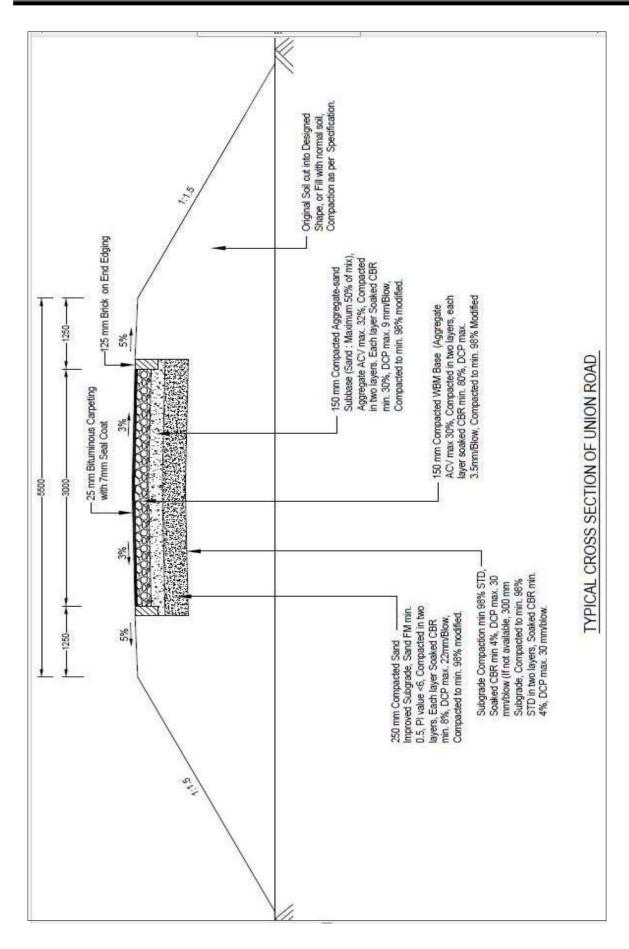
Typical Cross Section of Union Road (LGED, 2005)
